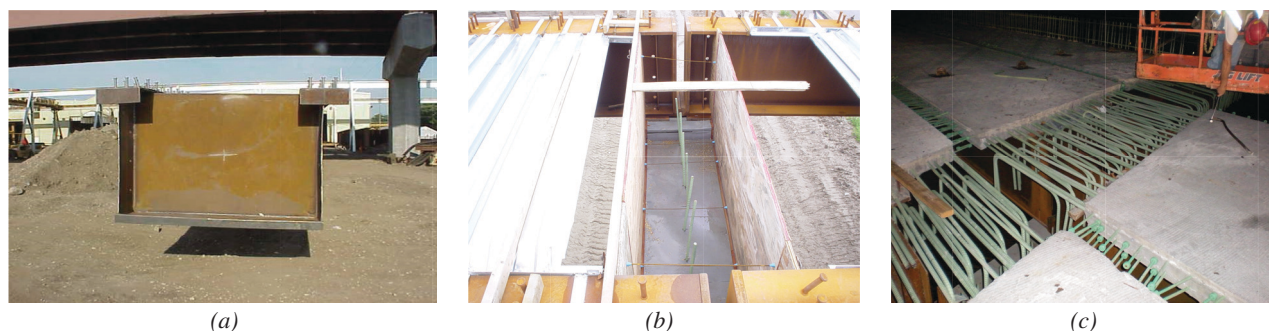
Bridge pier details: (a) N-2 over I-80 (box); (b) Sprague Street (I-girder); (c) 262nd Street (accelerated).
